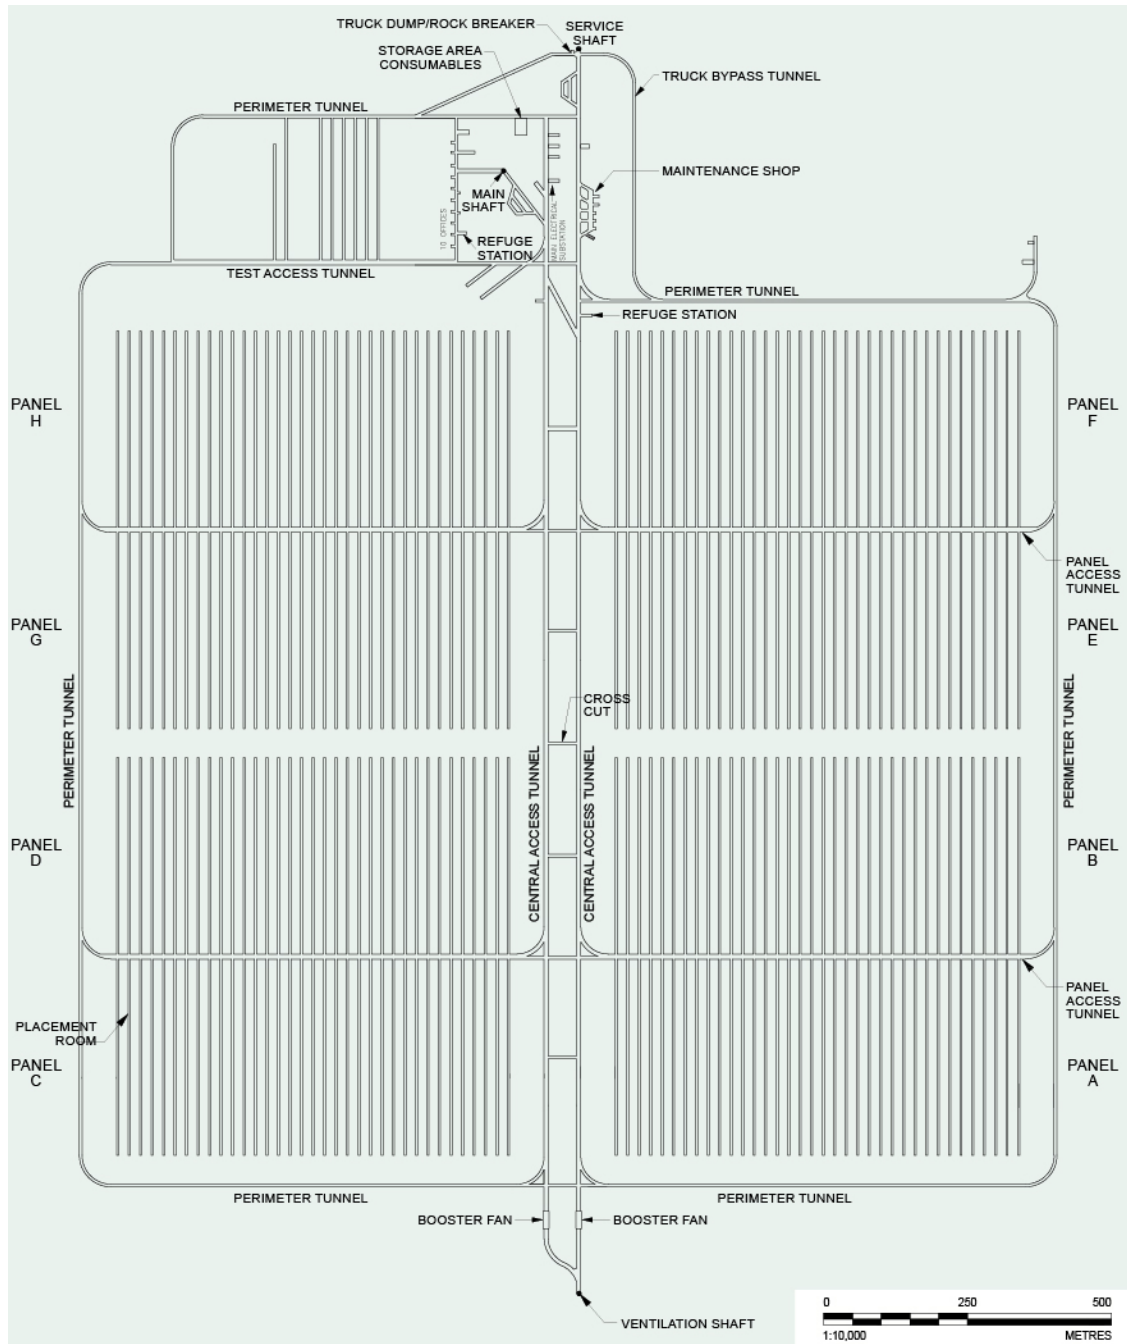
Example of an Underground Layout for a Deep Geological Repository
